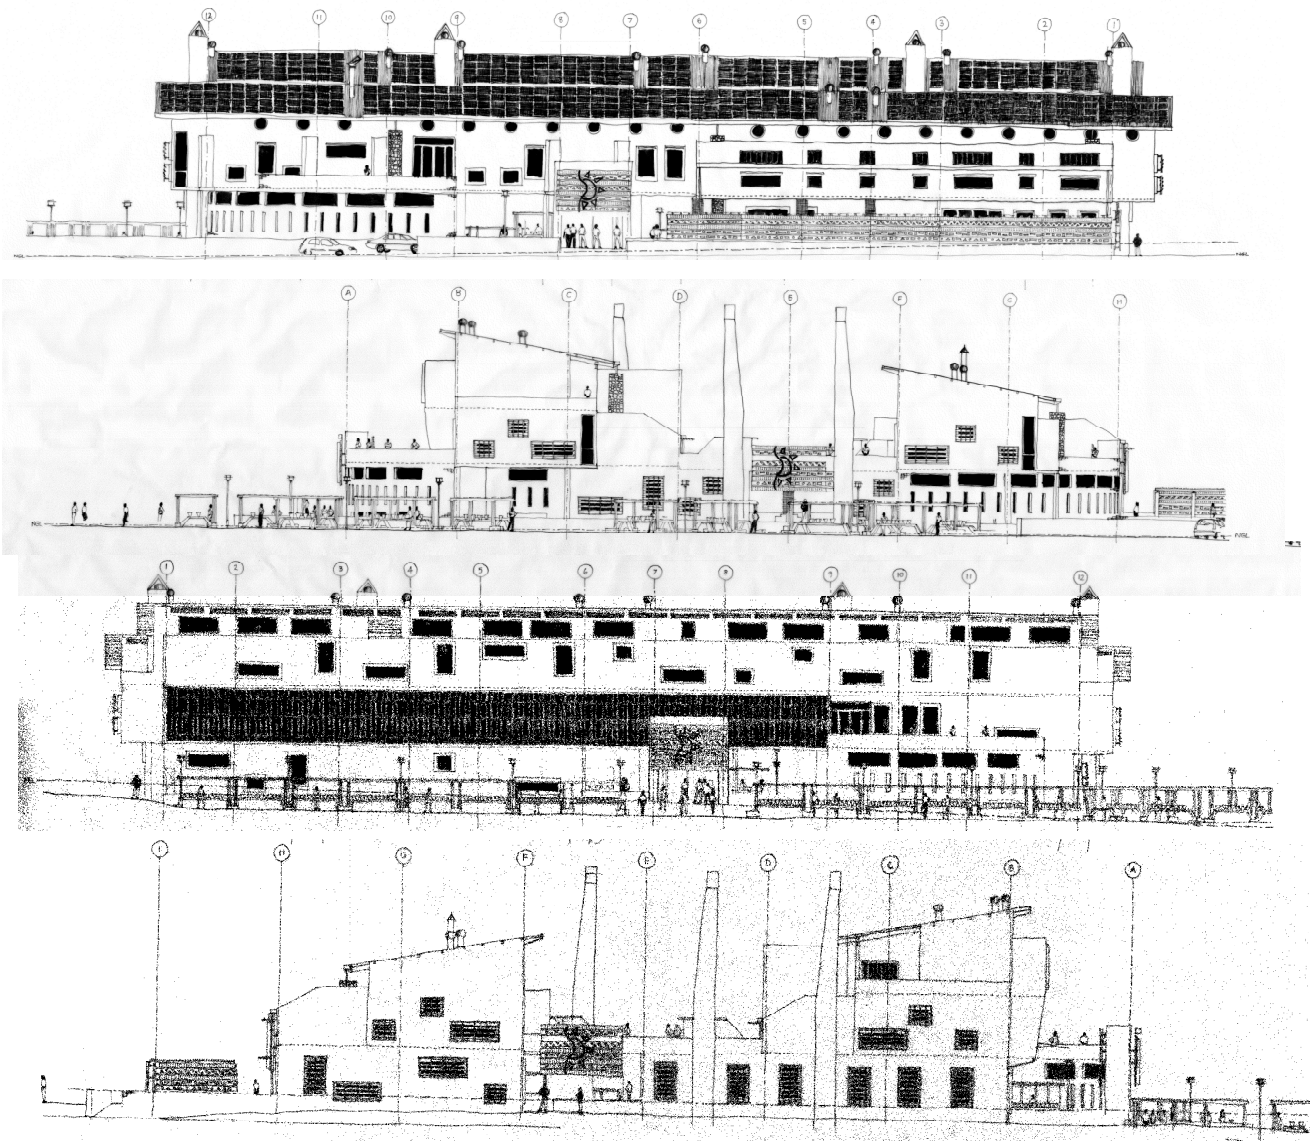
South elevation. Scale 1:200. (Author, 2009).
